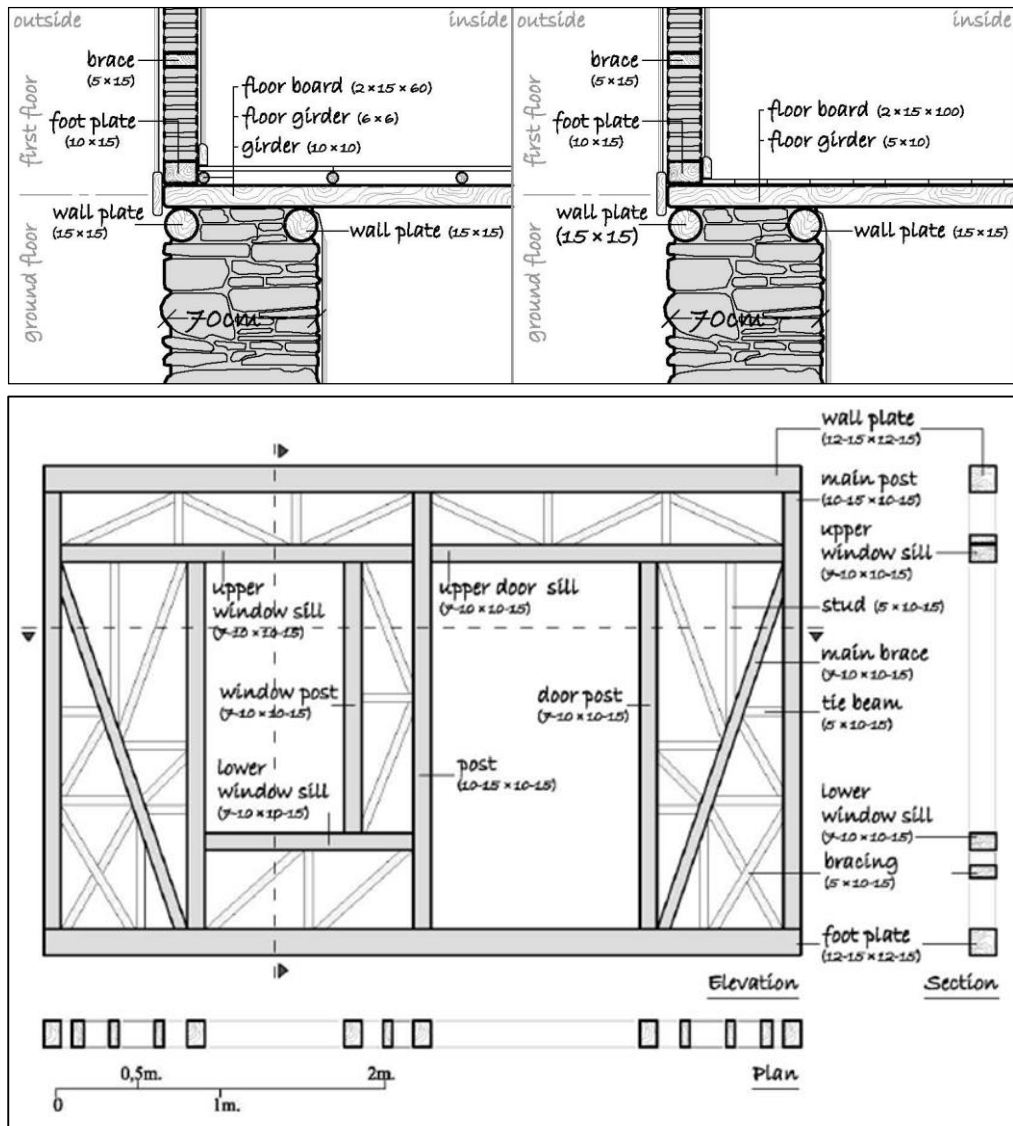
(Top) Schematic drawing of the detailing between masonry ground-floor and timber-frame upper floor and (Bottom) members forming a timber-frame based on a case study structure from Birgi, Turkey (after Diri, 2010)
